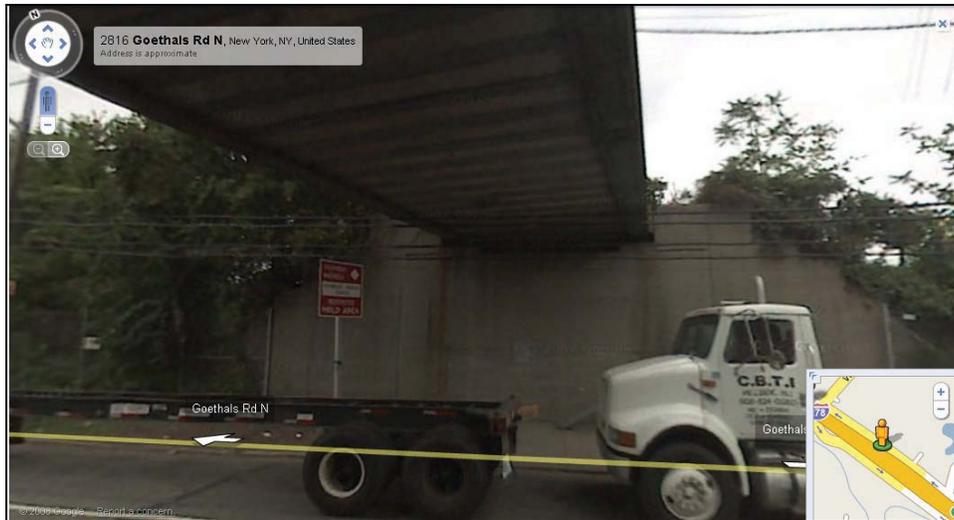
Abutment, Travis Branch over Goethals Road North. Google Street View.
